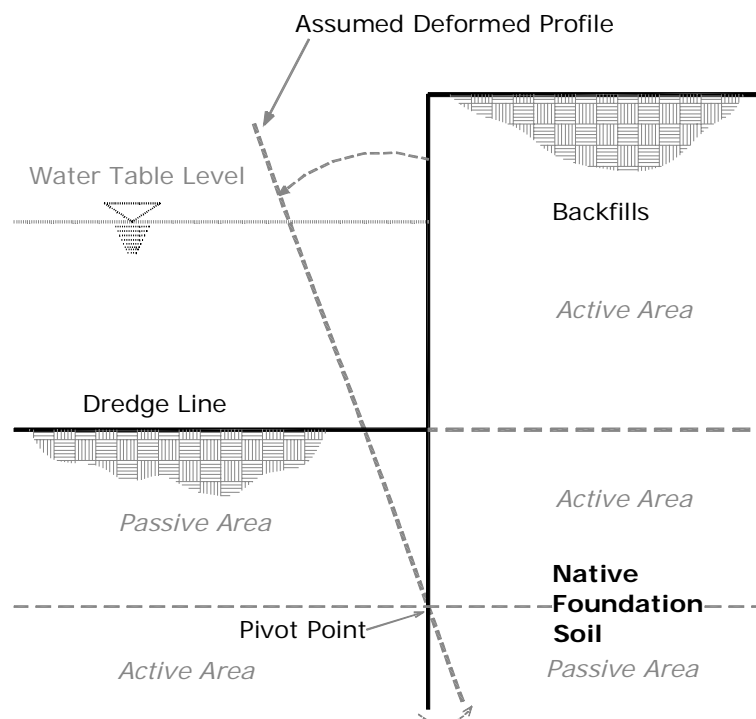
Assumed deformation profile of sheet pile (Clayton and Milititsky, 1983)
